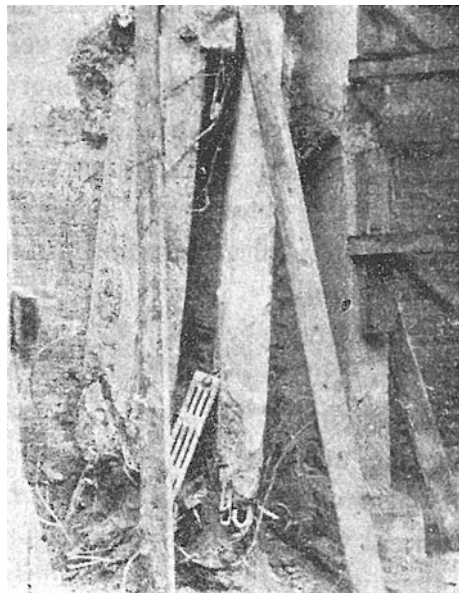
Carlton building debris—the columns of the ground floor and first floor that were found in basement after punching the slabs (Beles 1941a, b)
